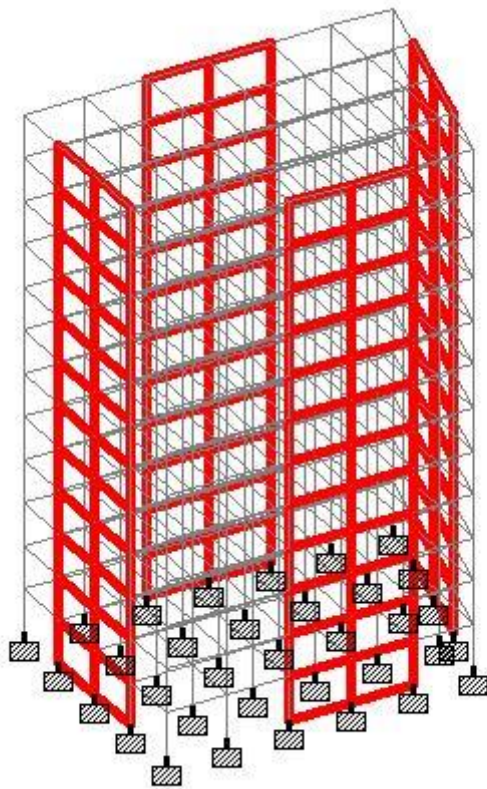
3D view of Non parallel System Irregular structure with Shear wall(12 storeys)
